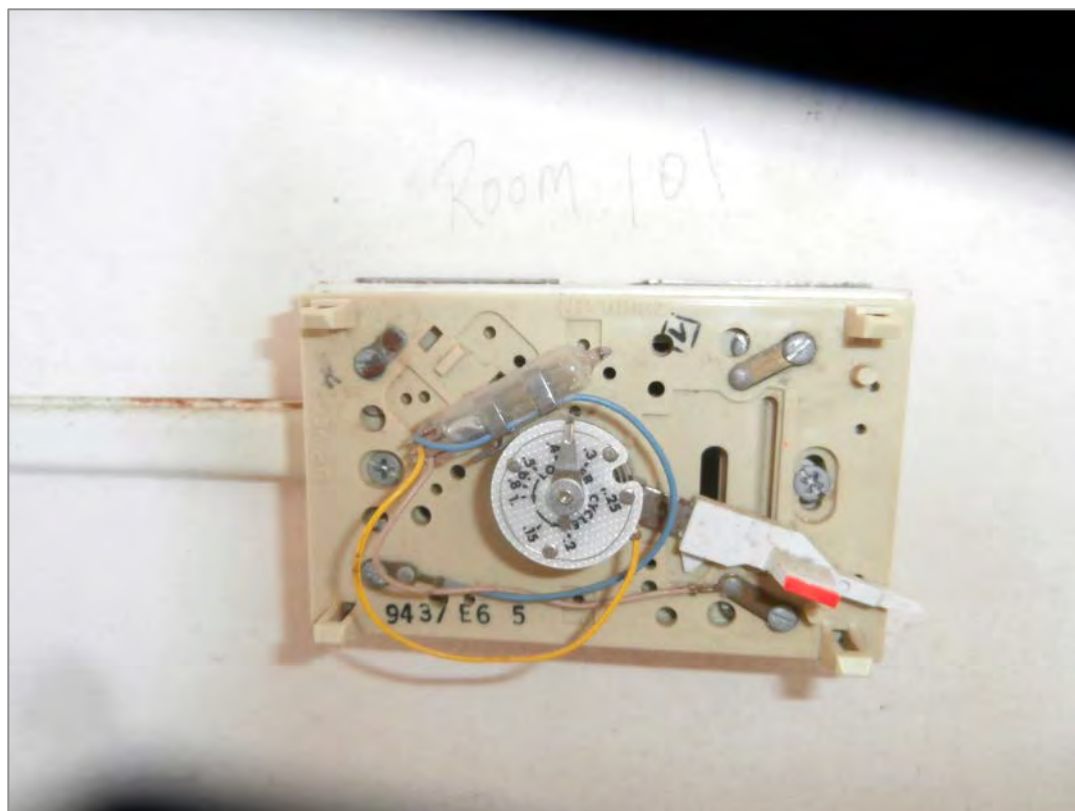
View of a typical thermostat (3 units located on first and second floor levels)
